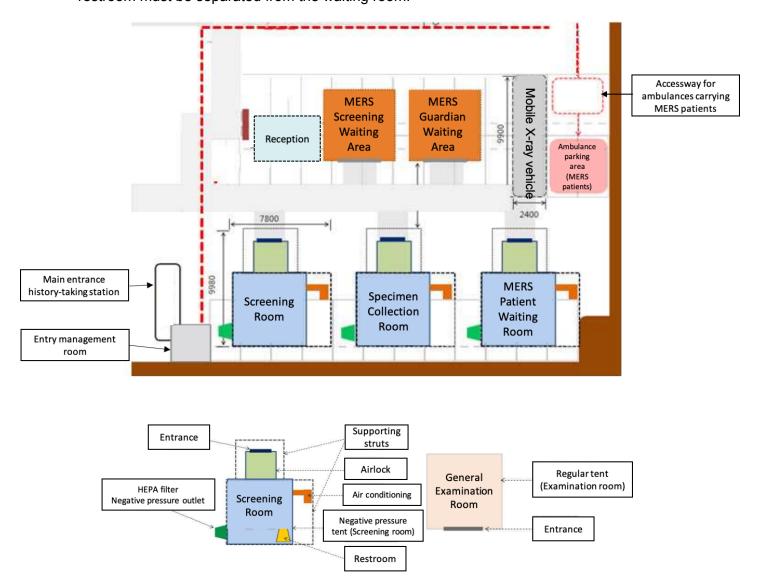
Example of COVID-19 Screening Center installation (installed in a separate location)
